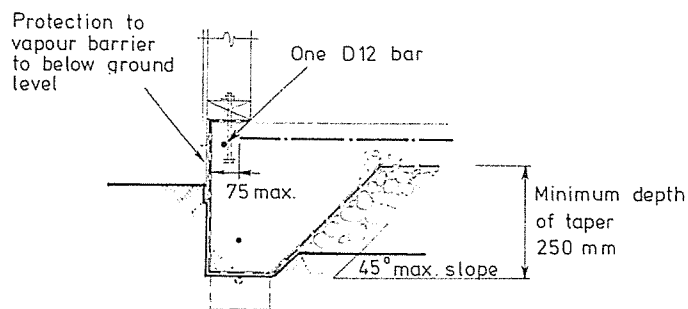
Protection of finished ground adjoining buildings with concrete slab-on-ground floors
